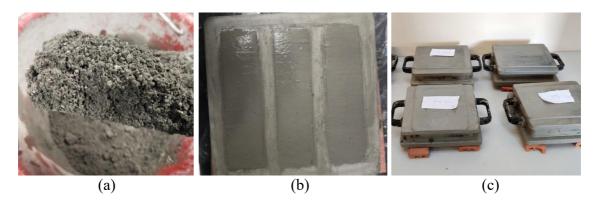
Specimen manufacturing: mixture (a), casting of prismatic beams (b), and moist curing (c)
